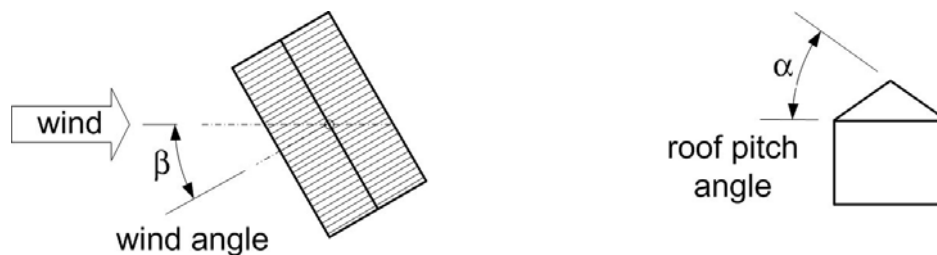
Definition of wind incident angle and roof pitch angle of the building
